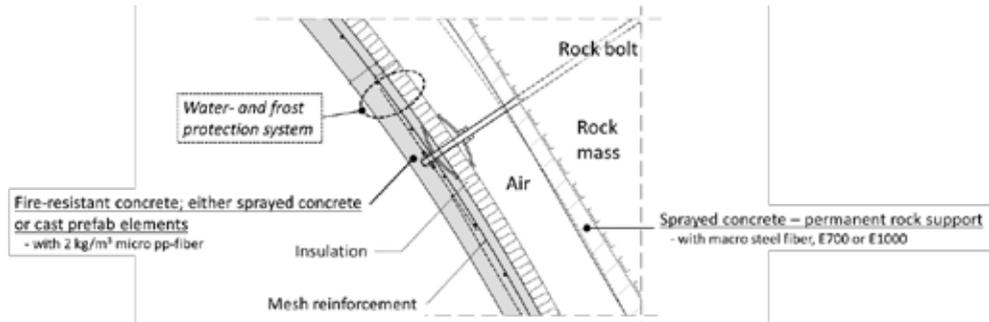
Typical build-up of a Norwegian tunnel (based on [2]): First, sprayed concrete permanent rock support (with separate bolting according to the rock mass class) produced according to [3]. Then, an inner lining of water- and frost protection including insulation and mesh-reinforced fire-resistant concrete.
